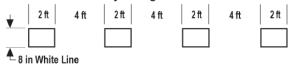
B - Lane Drop Markings at Conventional Highway Intersections
